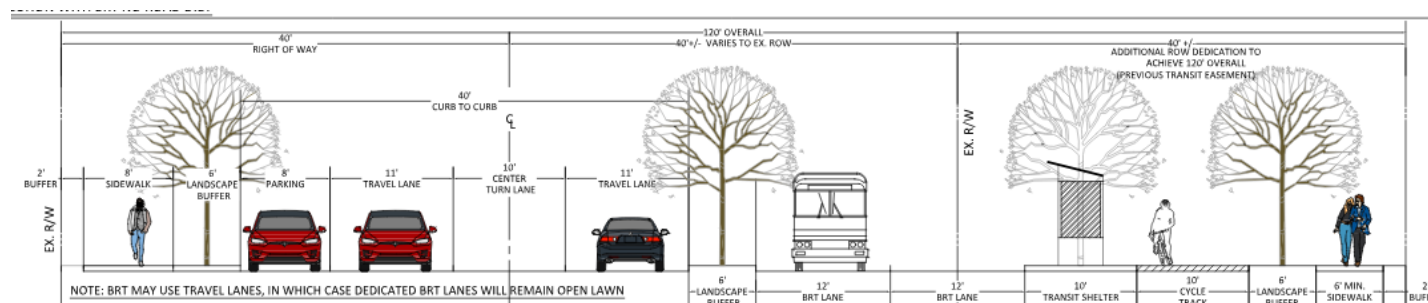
Proposed Rock Spring Drive Conceptual Ultimate Cross Section (with Road Diet and BRT in dedicated lanes)
